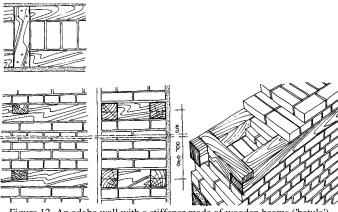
An adobe wall with a stiffener made of wooden beams ('hatula') Source: Author (Drowing, 1984)
